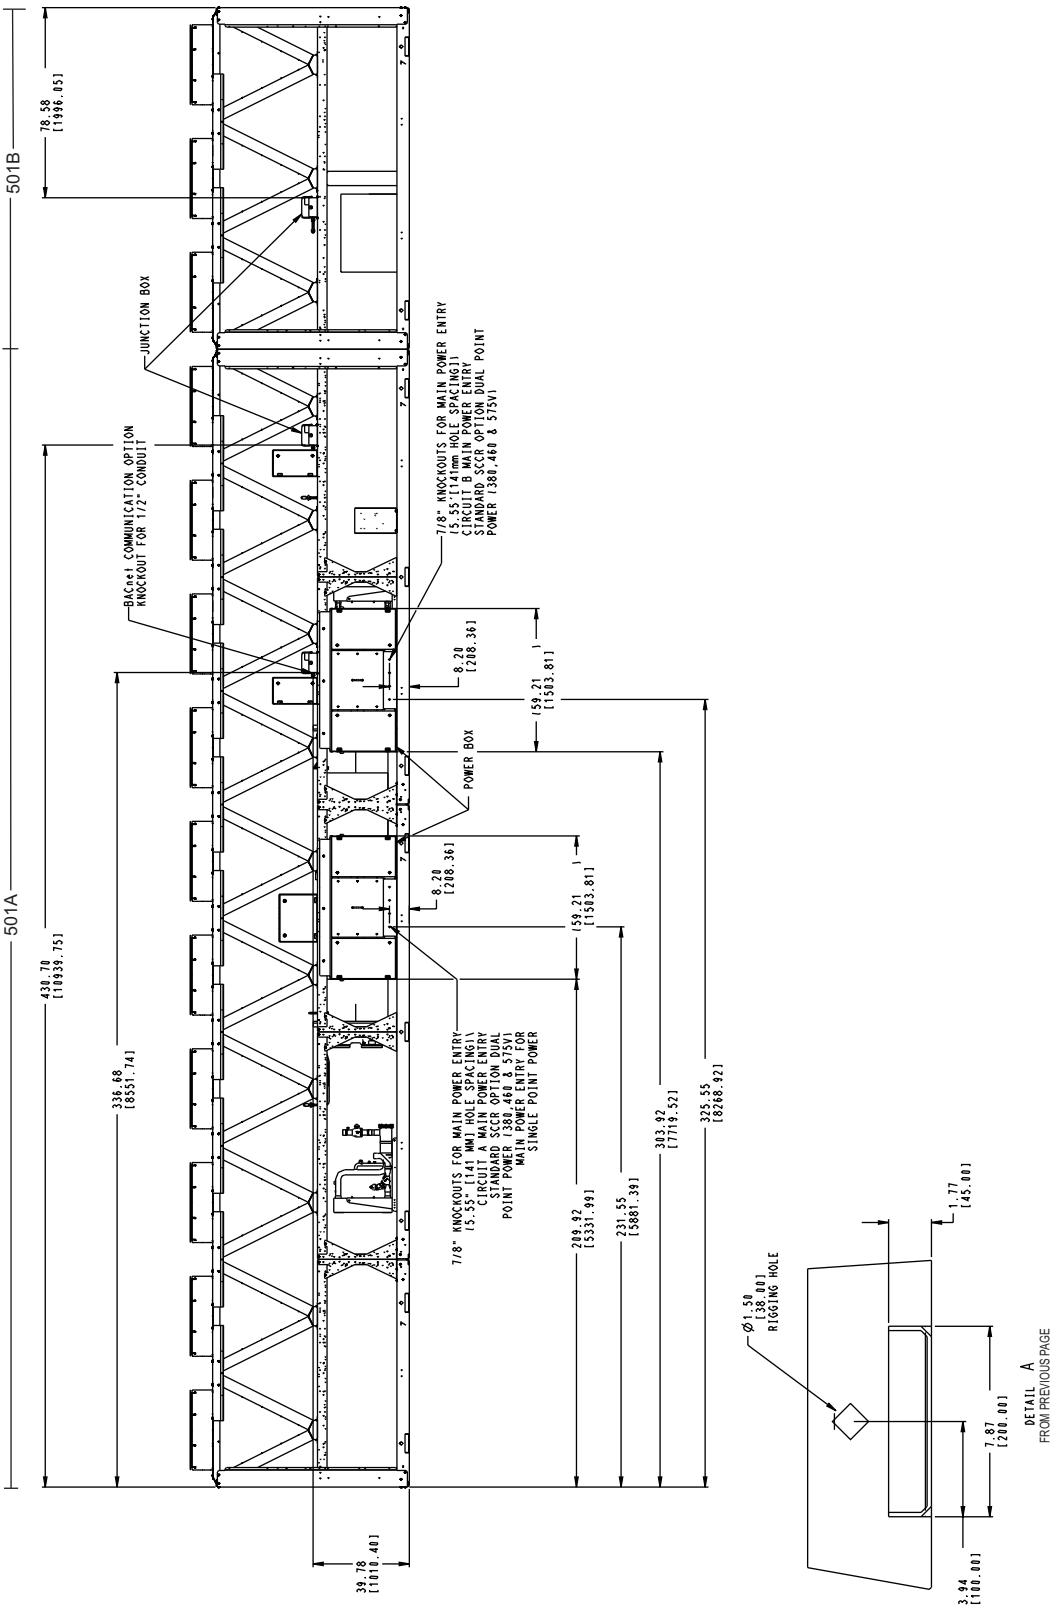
30XA501 (501A and 501B Modules) Air-Cooled Liquid Chiller Dimensions (cont)
